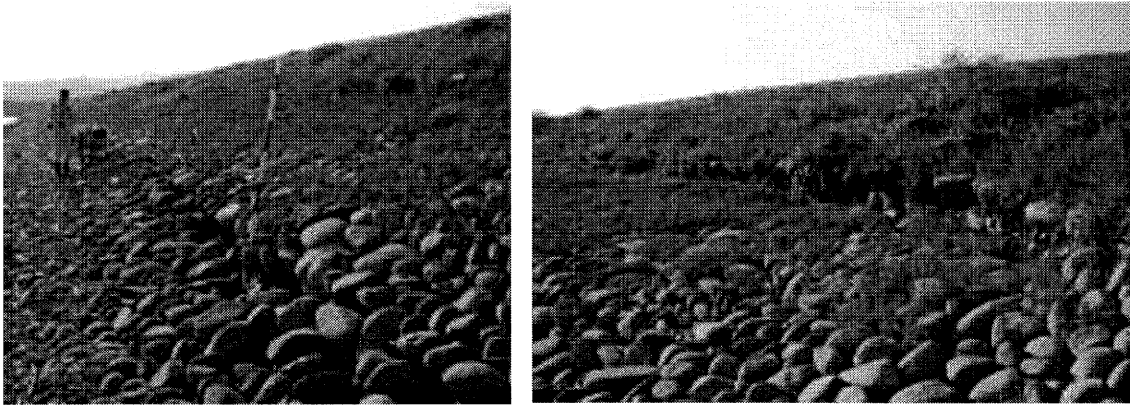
Cracks found on the upstream slope of Yamamoto Dam
